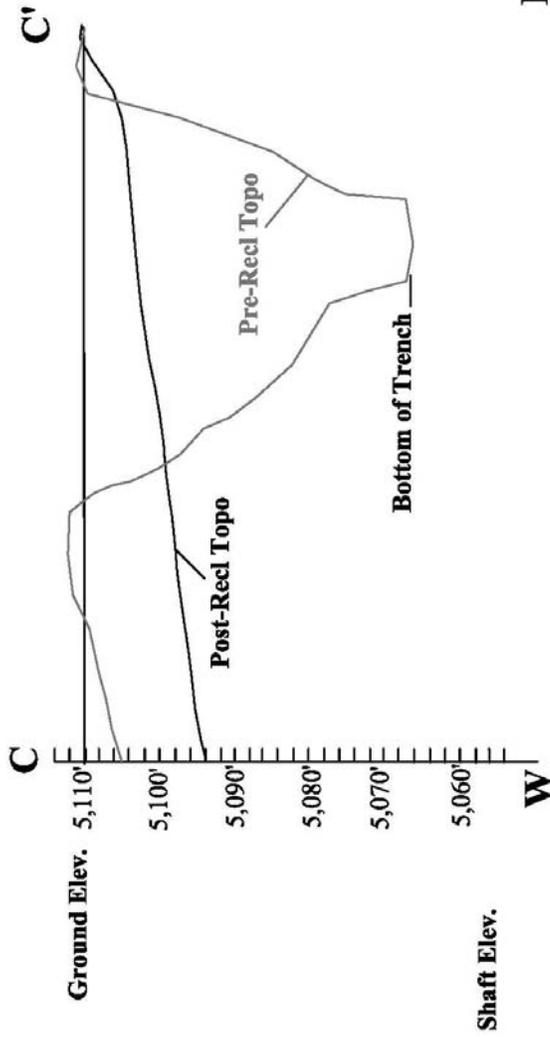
Appendix A. Shaft Excavation Cross Section and Elevations.
